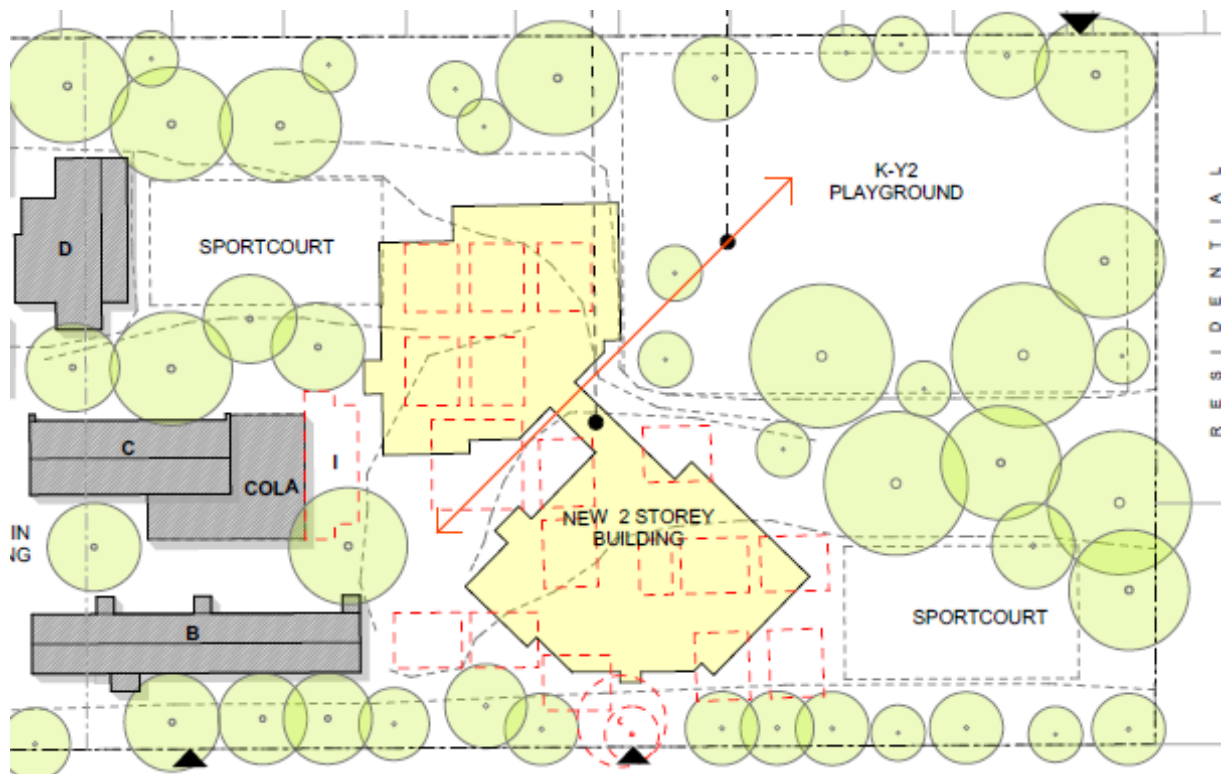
Early concept design strategy demonstrating a split building stepping down the site
